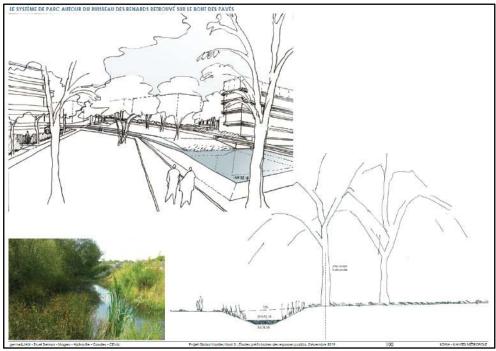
Focus on the new designed pond planned in the south section of the Canada park.
